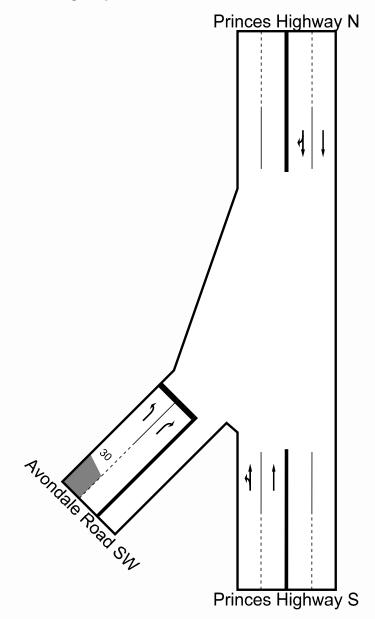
Princes Highway/Avondale Road 2008 Intersection Layout
